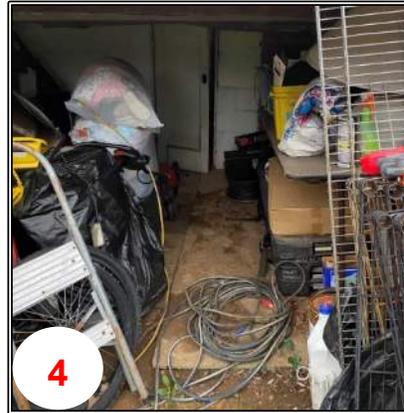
Property #3: Back side (north side) Figure 2.3.1.5 Property #3: Back side (under first-floor addition)
